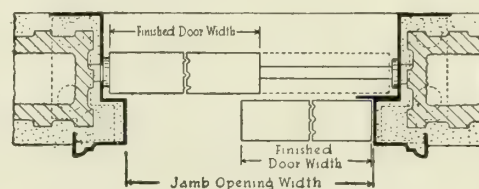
SPECIAL MOULDED STEEL BUCK FOR SLIDE AND SWING OR SLIDE AND STATIONARY ELEVATOR DOORS
